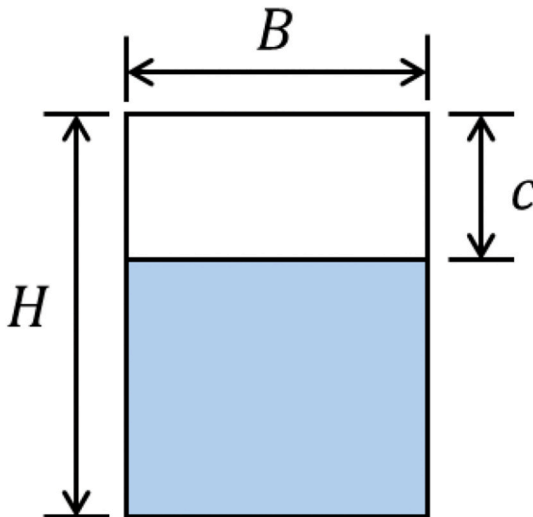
Cross-sectional dimensions and crack depth of a cracked beam.
